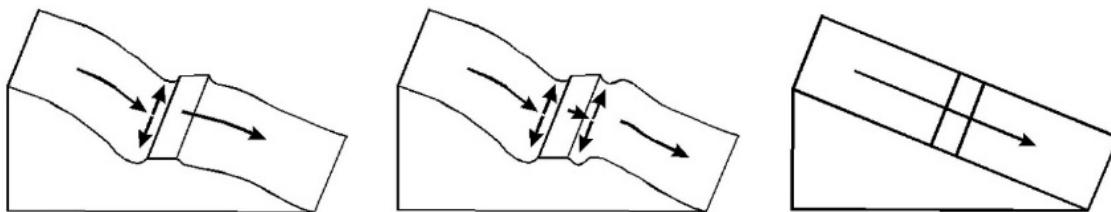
Illustrations of road classifications from Duke et al. 2003. Left: road with ditch only on upslope side. Center: road with ditches on both sides. Right: road without ditches.
